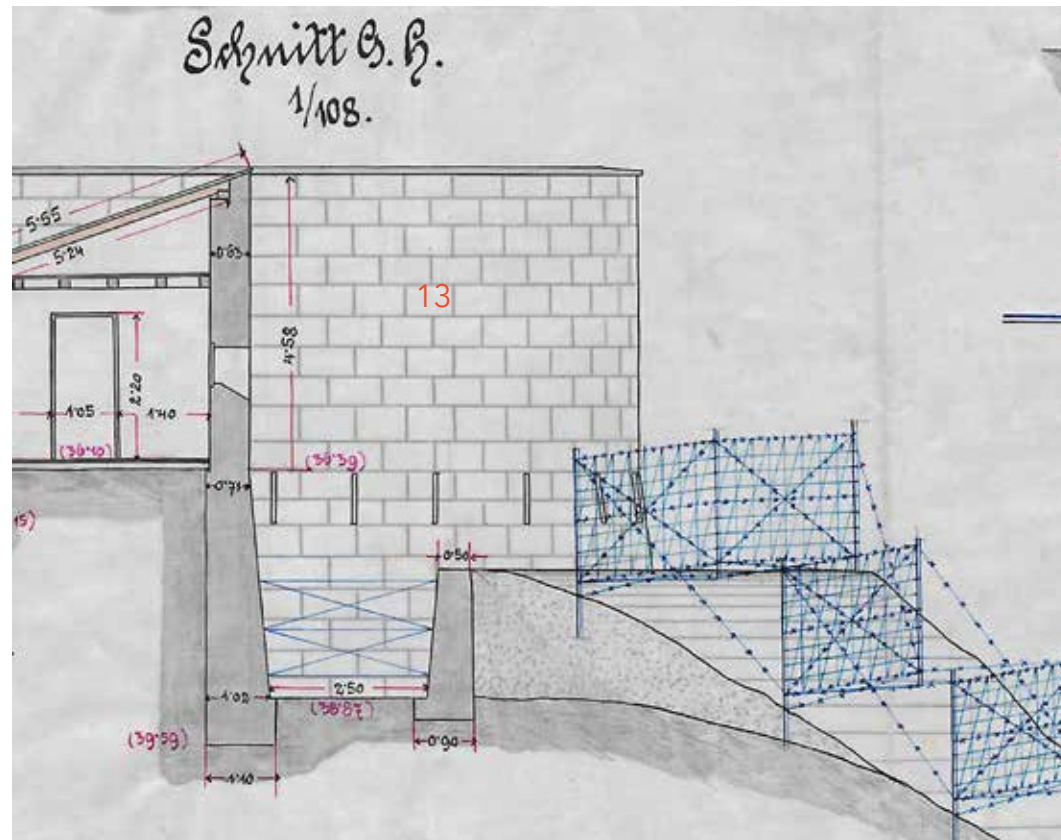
Section of a defense ditch in front of the southern caponier (13) Fort Kosmač Rapports plan, 1902 Credits: KA Wien
